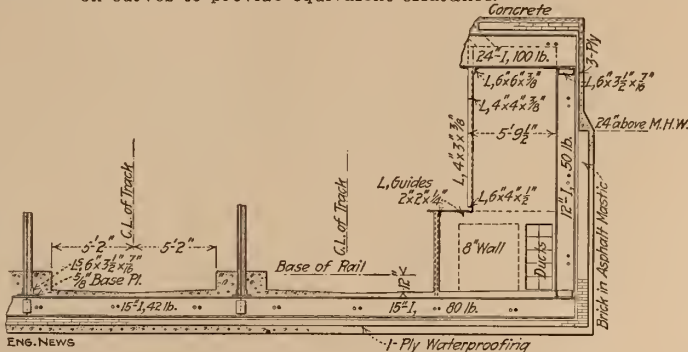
FLOOR ON SECTION 12 OF I-BEAMS AND CONCRETE
